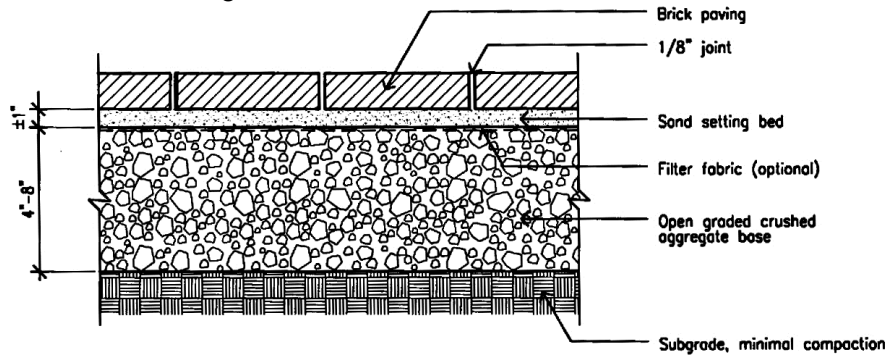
Profile of Brick Paver Installation (BASMAA, 1999)
